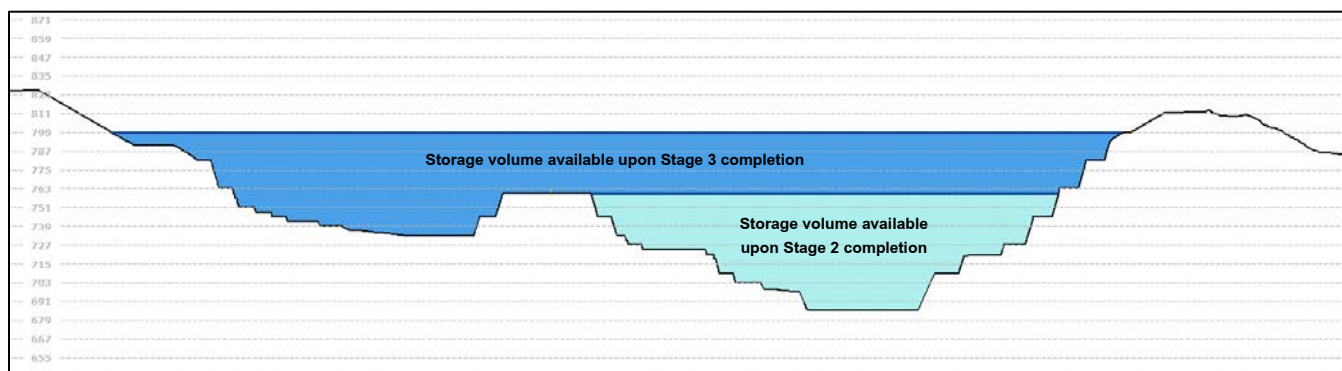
Section through Area 2 Pit showing storage volume made available with staged mining of Area 2.
